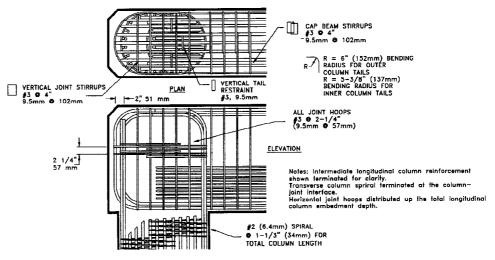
Reinforcement details for the bridge knee joint unit with conventional reinforcement.
